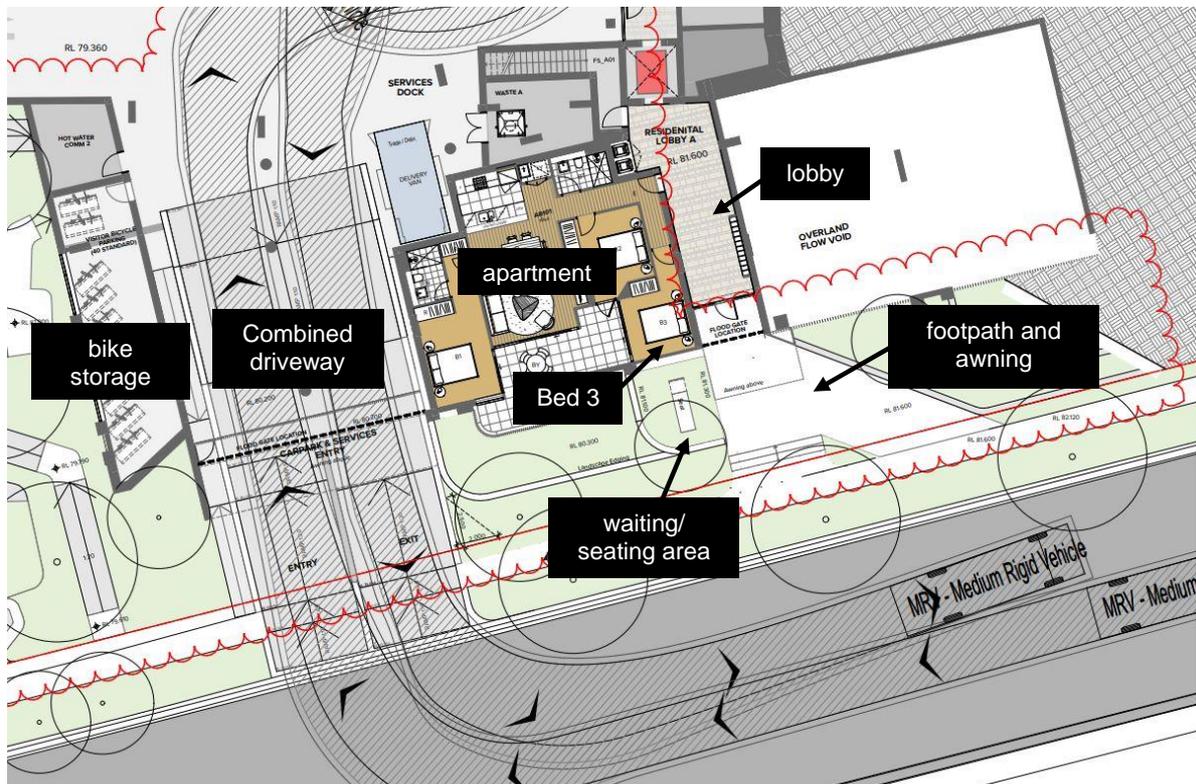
| Proposed ground floor of Building A (Source: Applicant's RTS)
